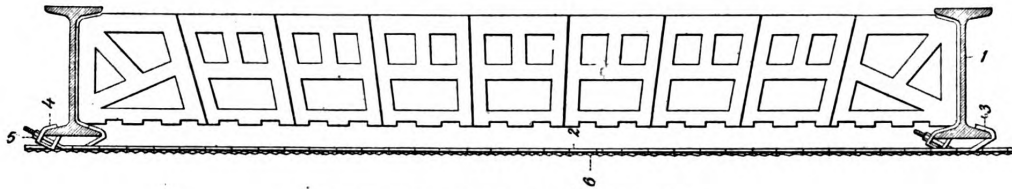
Lathing Applied to Beams to make a Ceiling.
